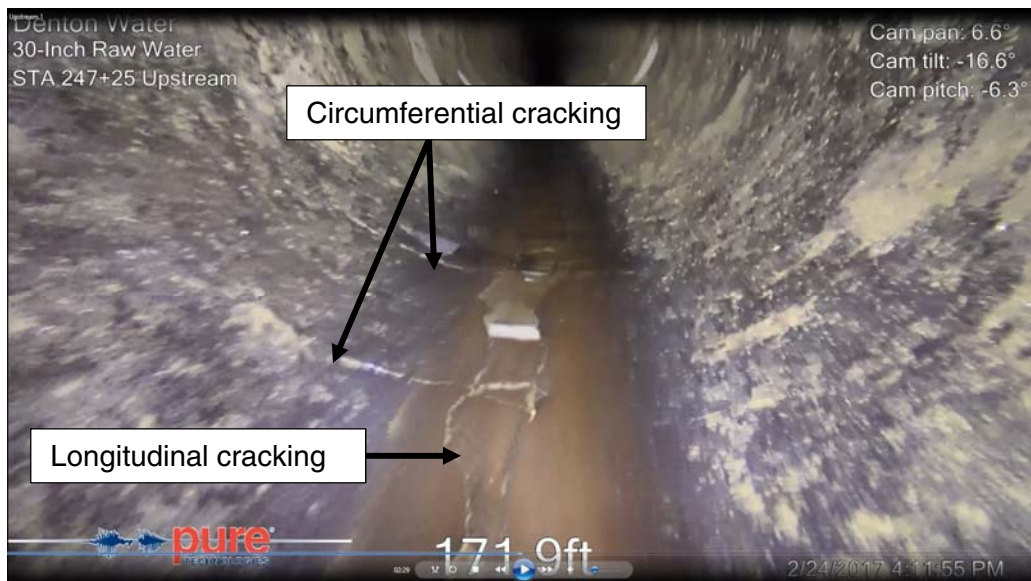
Pipe 2652, Longitudinal cracking along invert with intersecting circumferential cracks
